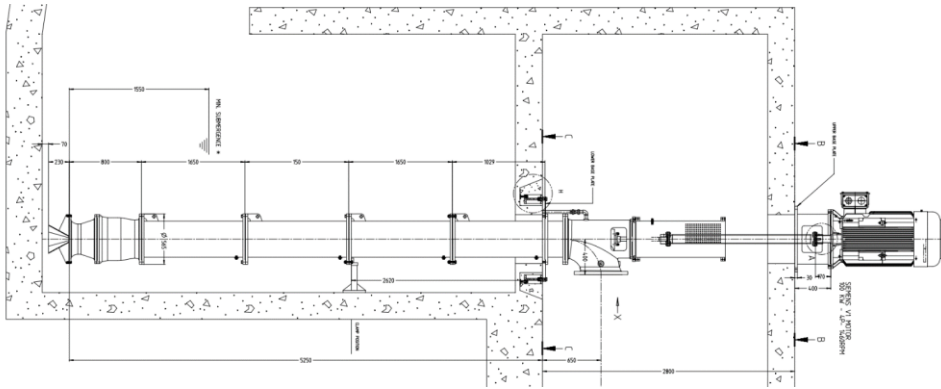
Connecting the output of the installed pump to the collector pipeline. The picture shows non-return, stop valves and a built-in cone that reduces pipe diameters
